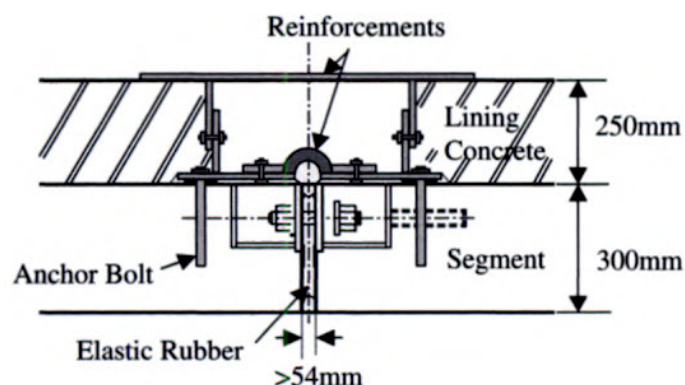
Reinforced expansion joint of *Daiba* tunnel, Japan (Komiya et al., 2006)
